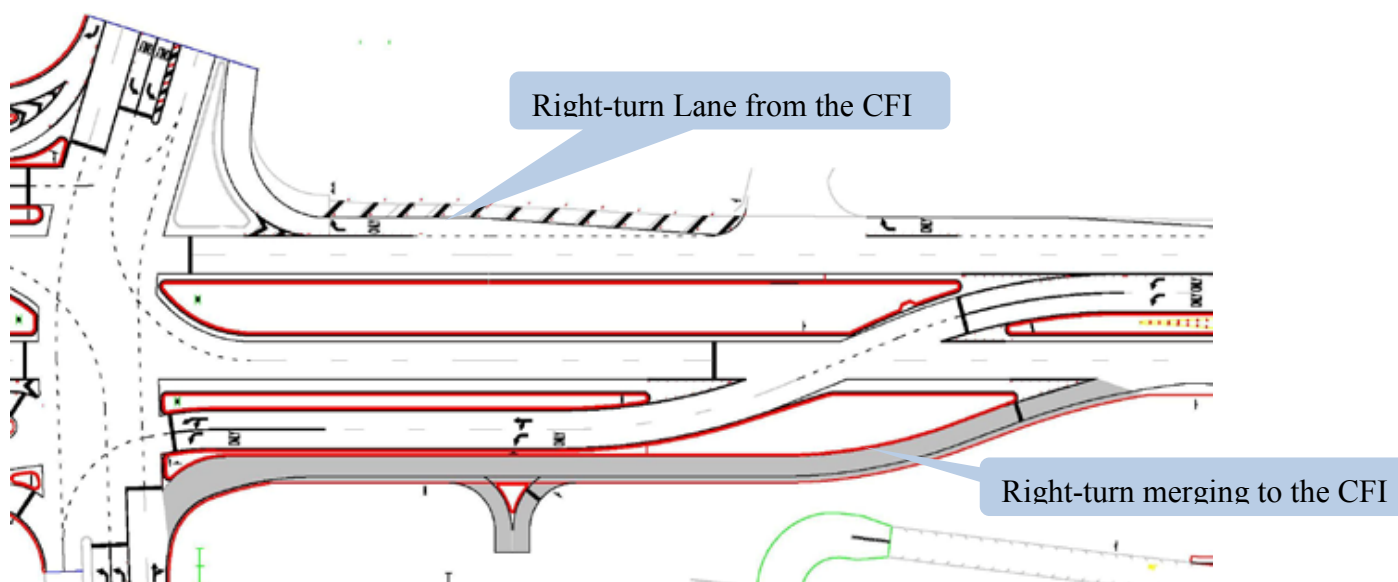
Right-turn merge lane/frontage road at CFI in Baton Rouge, LA.
